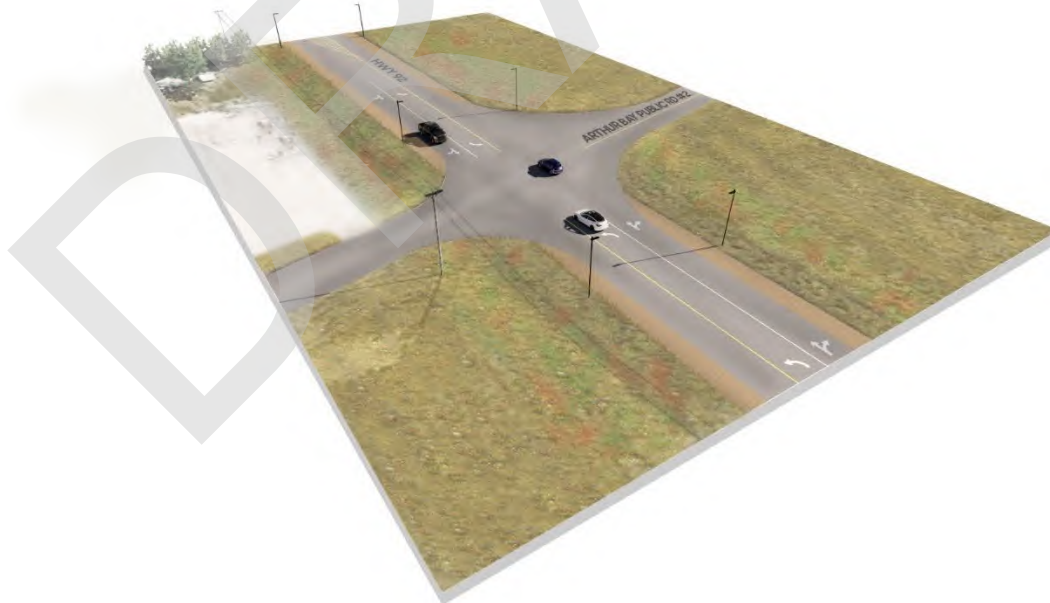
Lake McConaughy Road Improvement – Typical Intersection Improvements
